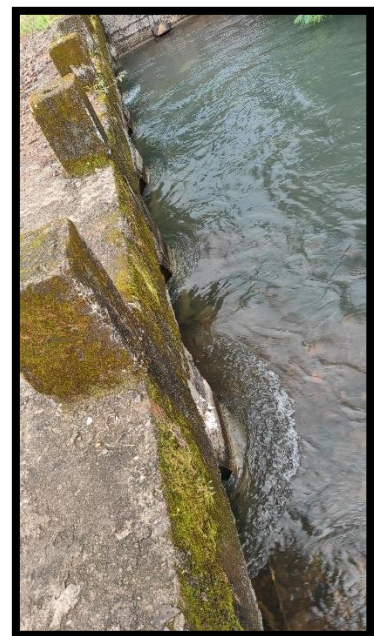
,32: Students understood different components of Box culverts and types of wingwalls. This box culvert was there just outside of power plant on access road to pass water released from power plant. Box culverts are used where a large volume of water needs to be carried or where space constraints necessitate a flatter profile. Earlier we studied pipe culverts used on road to Jor Village (fig number 16, 17, 18)
